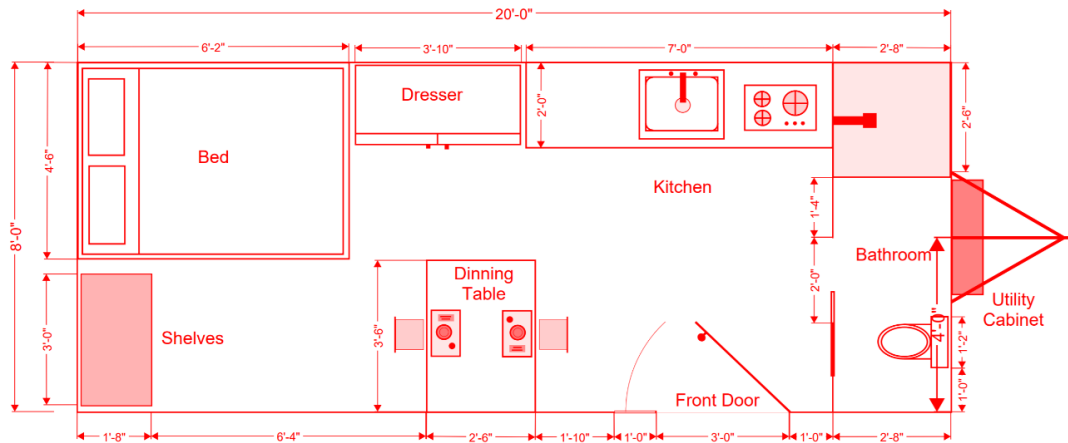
2D Floor Plan of Tiny Home w/ Dimensions
